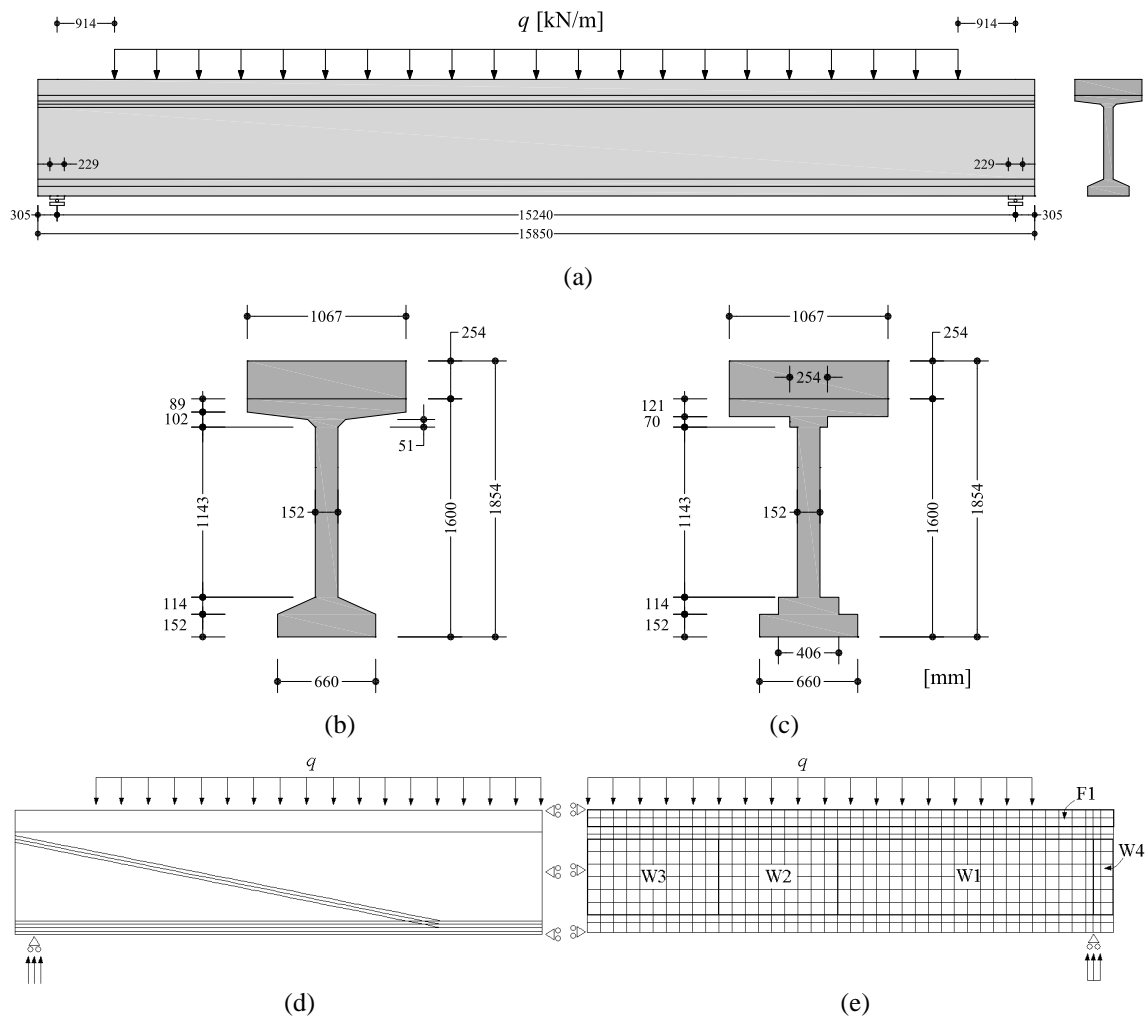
Geometry of the tested girders: (a) Elevation; (b) Cross-section; (c) Cross-section as modelled; (d) West half of beam G1 with draped strands; (e) Finite element mesh.
